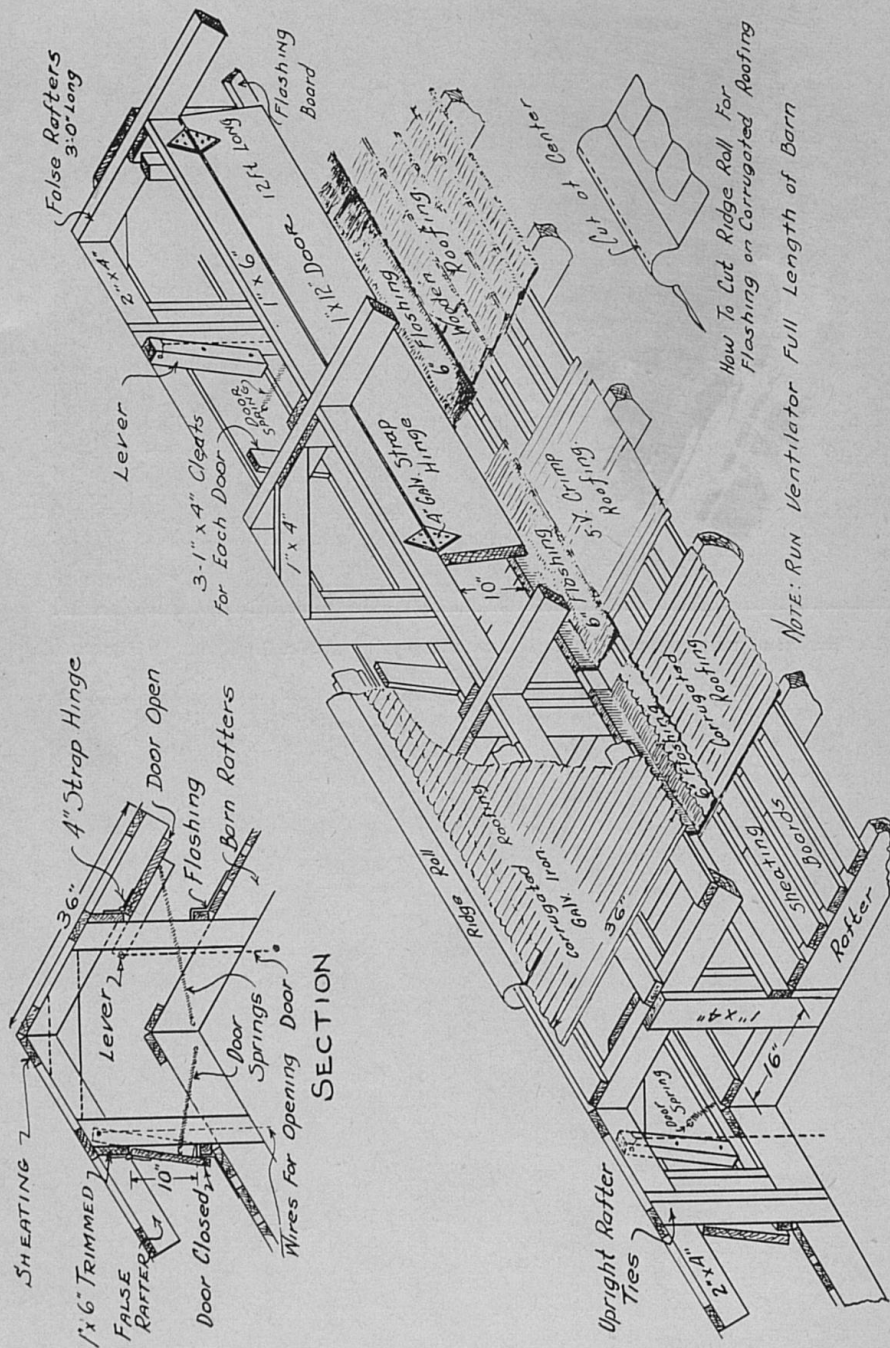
Details of ridge ventilator built according to Plan No. 2, 6-foot section shown. A lever and door spring should be placed at each end of a 12-foot door. See Figure 12, page 16.
